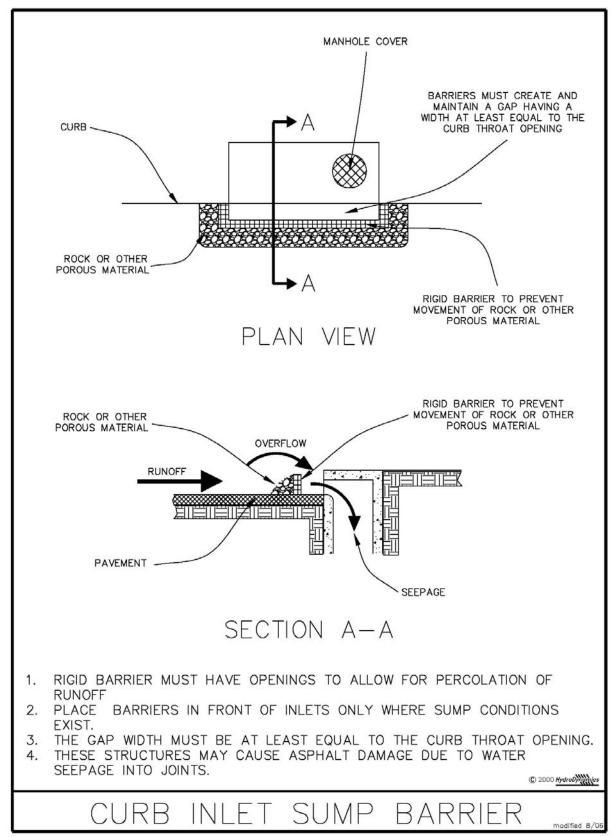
Illustration of a Curb Inlet "Sump" Barrier
